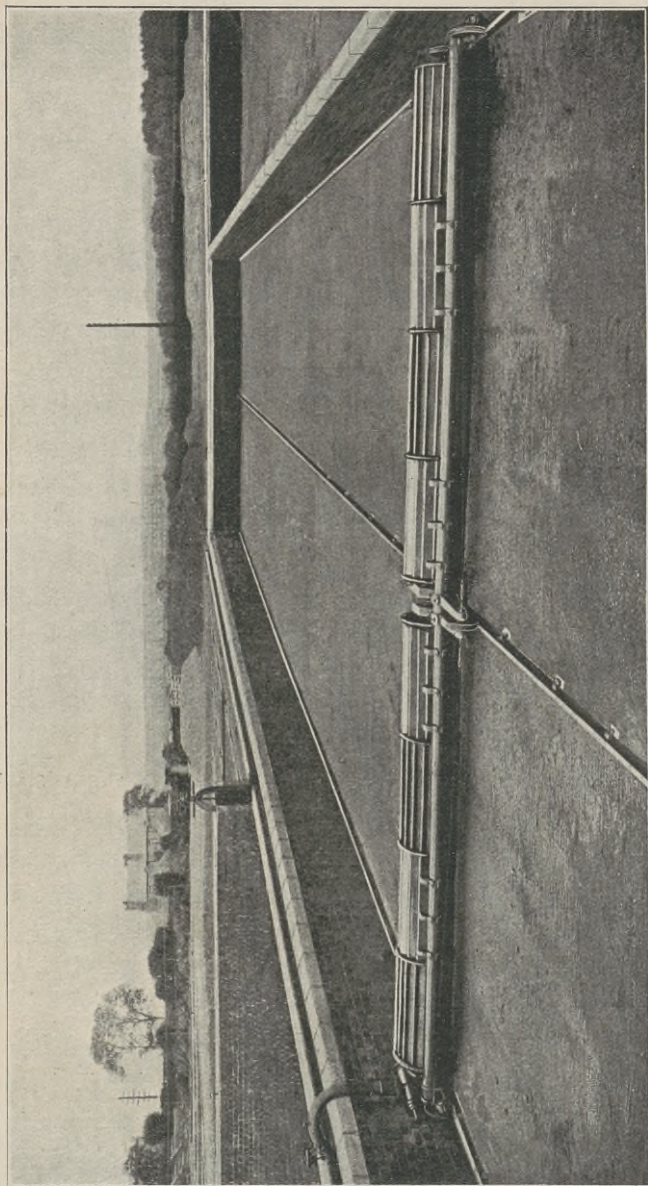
Water-wheel Distributor for Rectangular Filters, Showing Arrangement of Feed Pipes and Rails for Wheels carrying Distributor.
